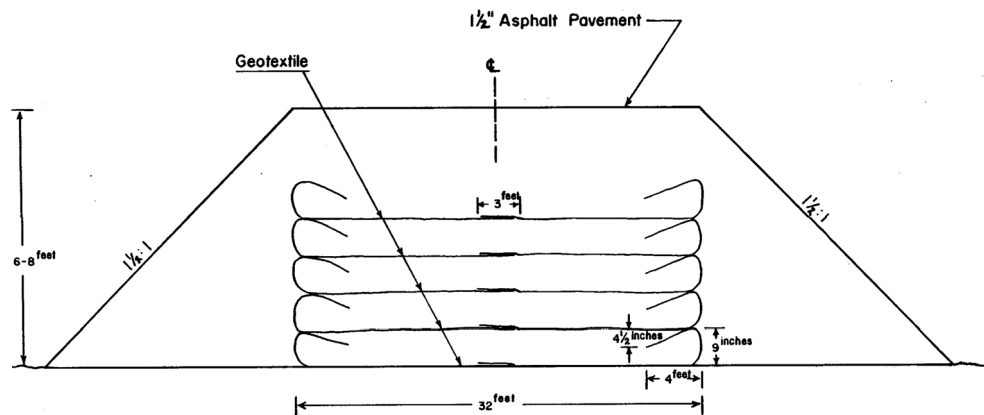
Wrapped geotextile reinforcement (Johnson, 1983)
